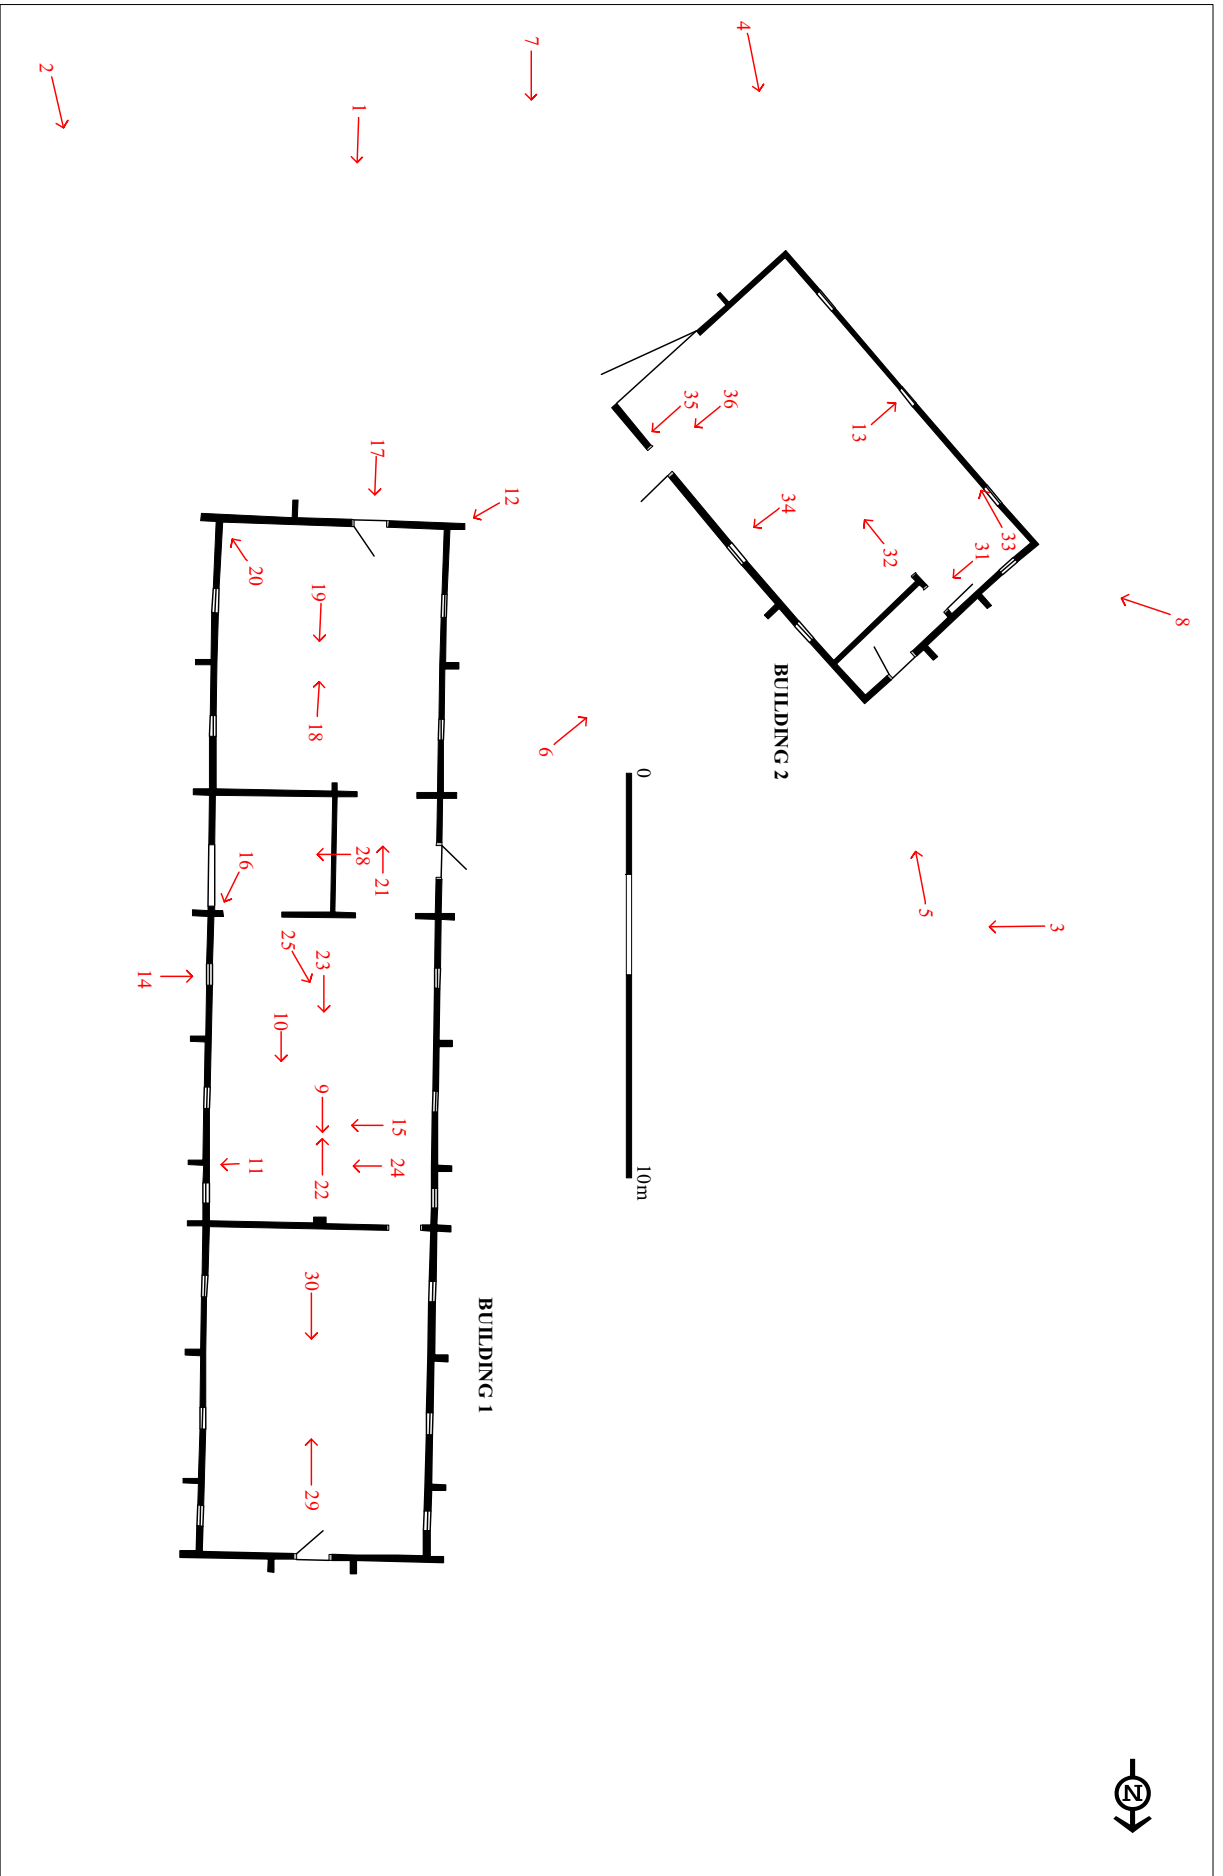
Buildings 1 and 2; plates 1 to 36 locations
